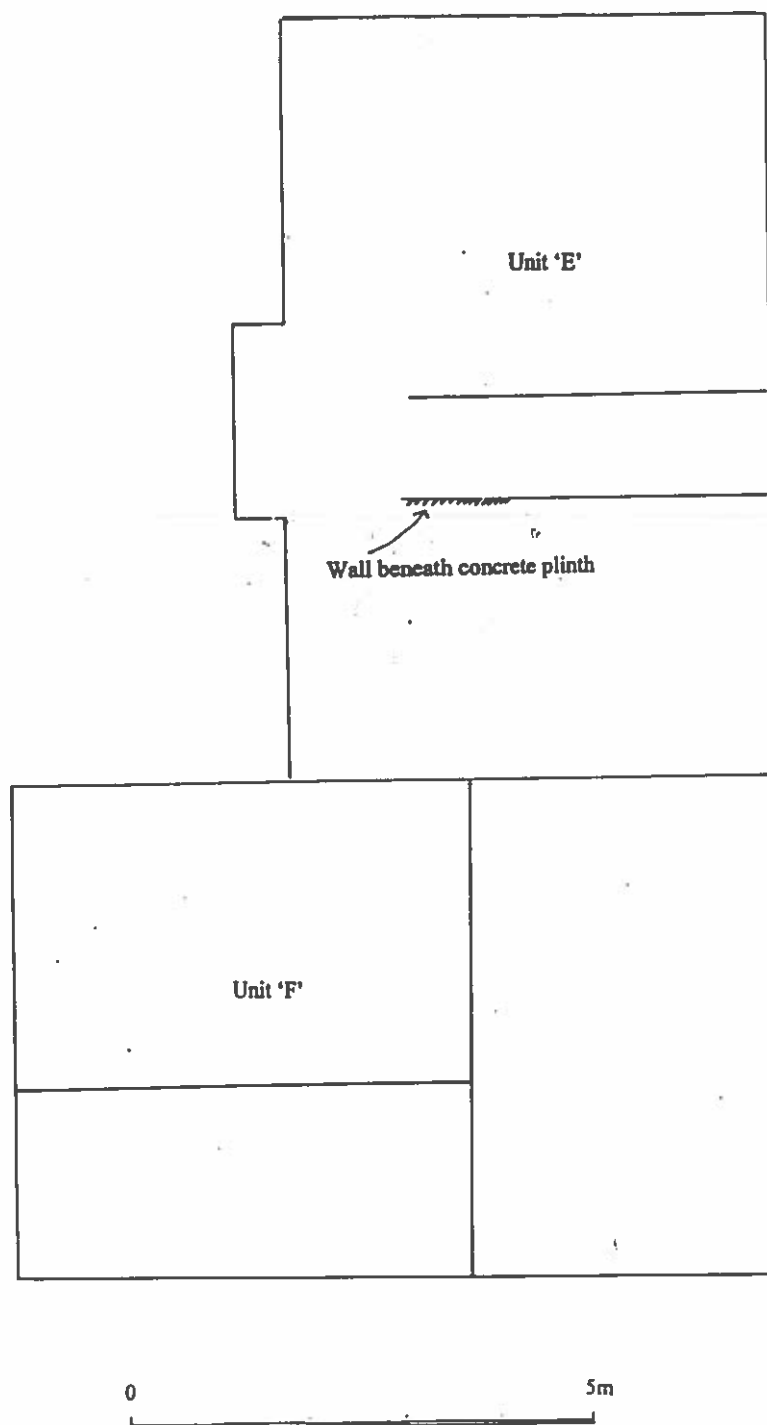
Plan of wall foundations for Units 'E' and 'F'
